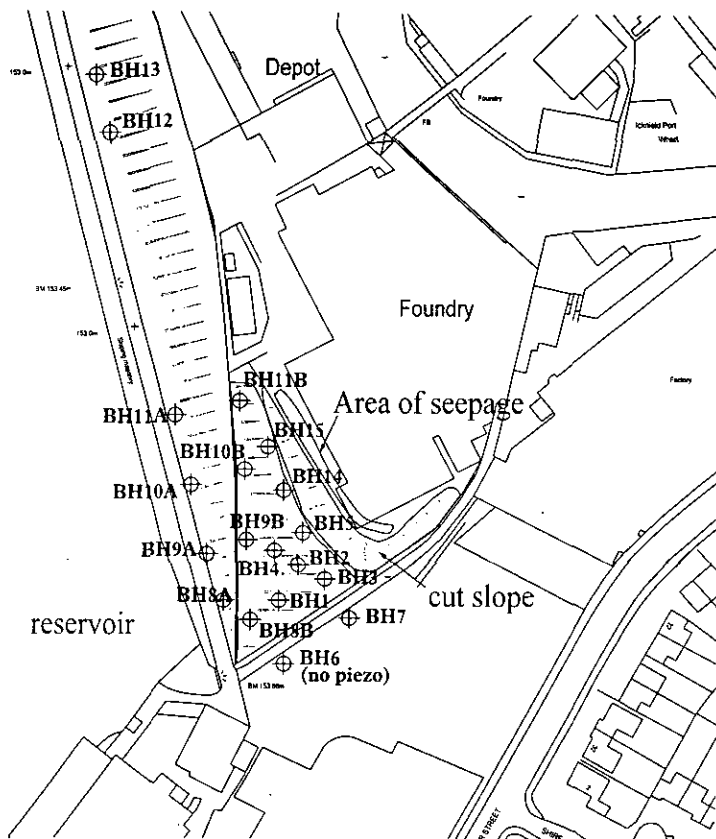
Borehole location plan, showing locations of piezometers installed in 1997 (not to scale). © Crown Copyright.
